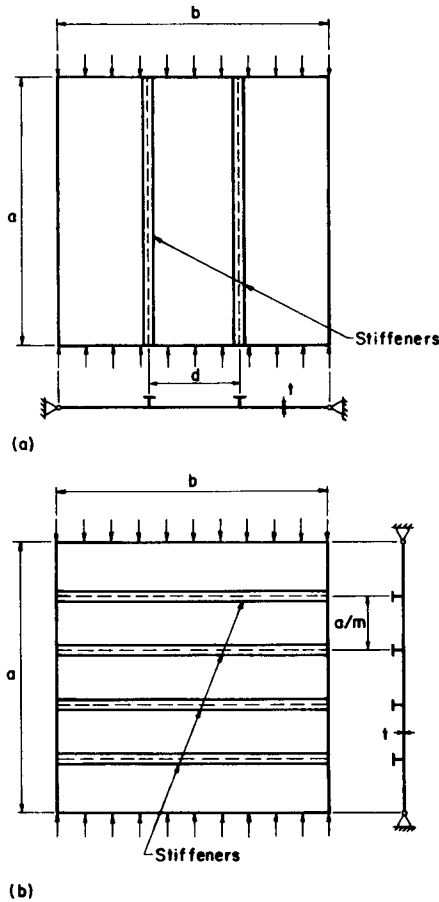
Stiffened plate panels; (a) panel with longitudinal stiffeners; (b) panel with transverse stiffeners.
